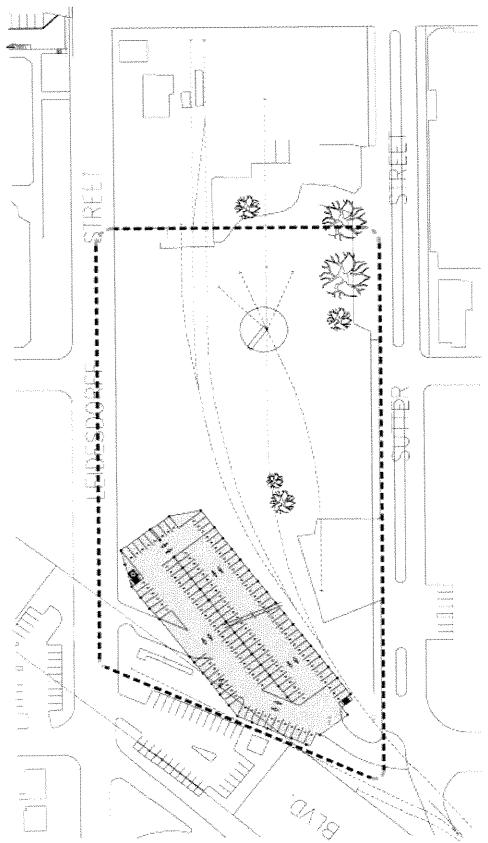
Railroad Block Parking Structure Site Plan – Option B
